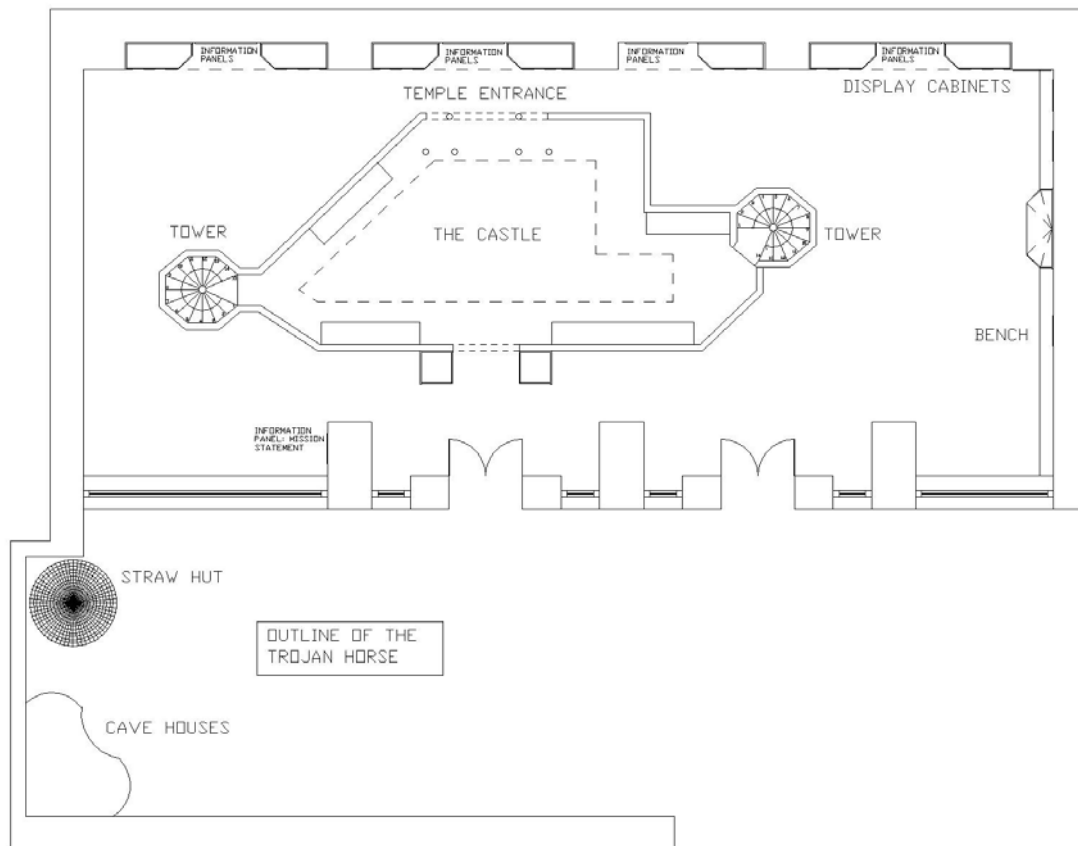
Ground floor plan of the current Children's Museum (Drawing by M. Bige Varlier)
